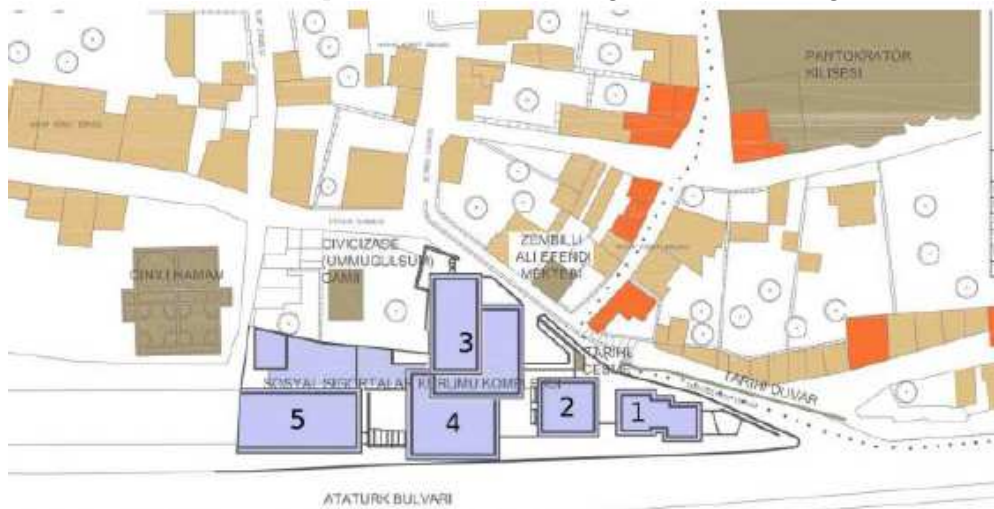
Site Plan. 1.Coffeehouse 2. Bank and Dining Hall 3-4. Dispenser 5. Offices (Porsuk 2008).
